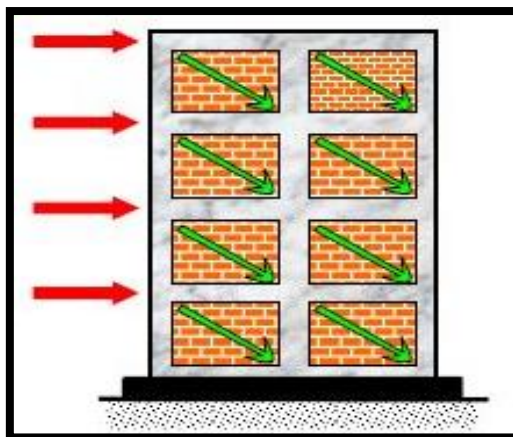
Masonry infilled frame: Infill helps transfer lateral loads through diagonal strut action and reduces demand on columns
